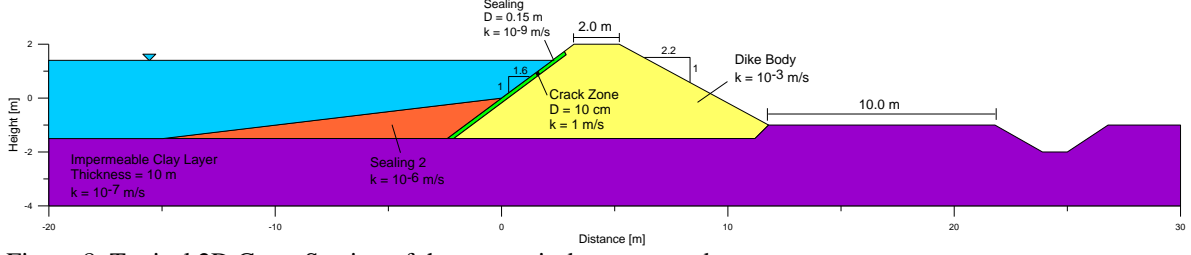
Typical 2D Cross Section of the reservoir dam case study
